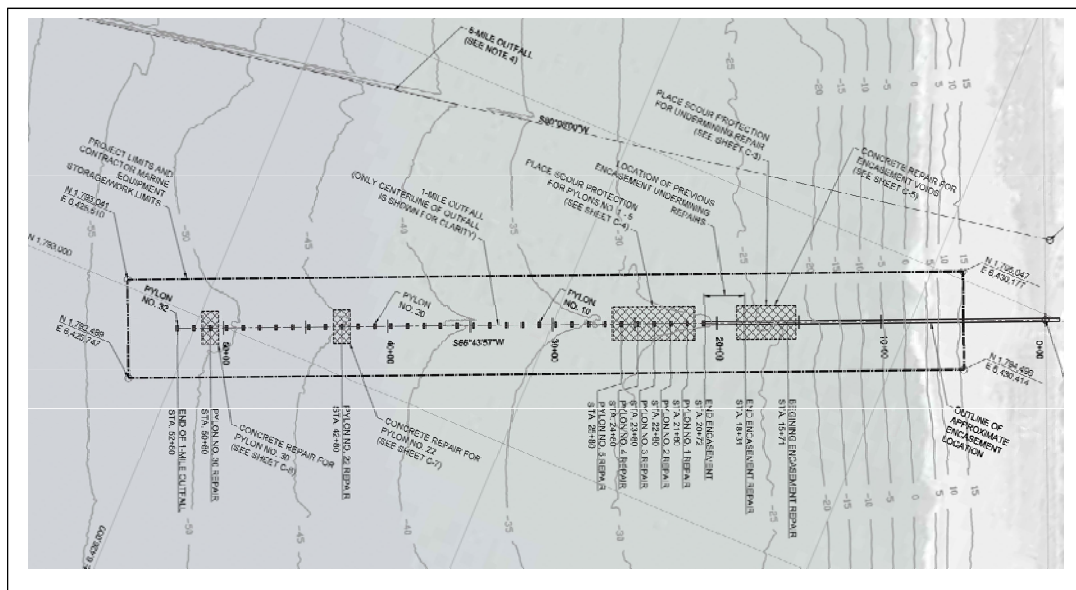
Map of HTP 1-Mile Outfall, showing location of rock placement & concrete repairs.
